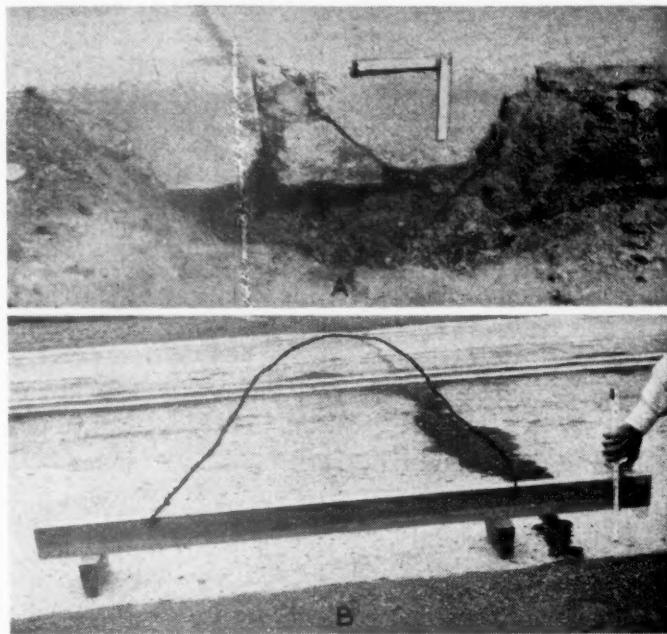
A, SHOULDER REMOVED FOR INSPECTION OF EXPANSION JOINT; B, DEVICE FOR MEASURING FAULTING AT JOINTS AND CRACKS.
